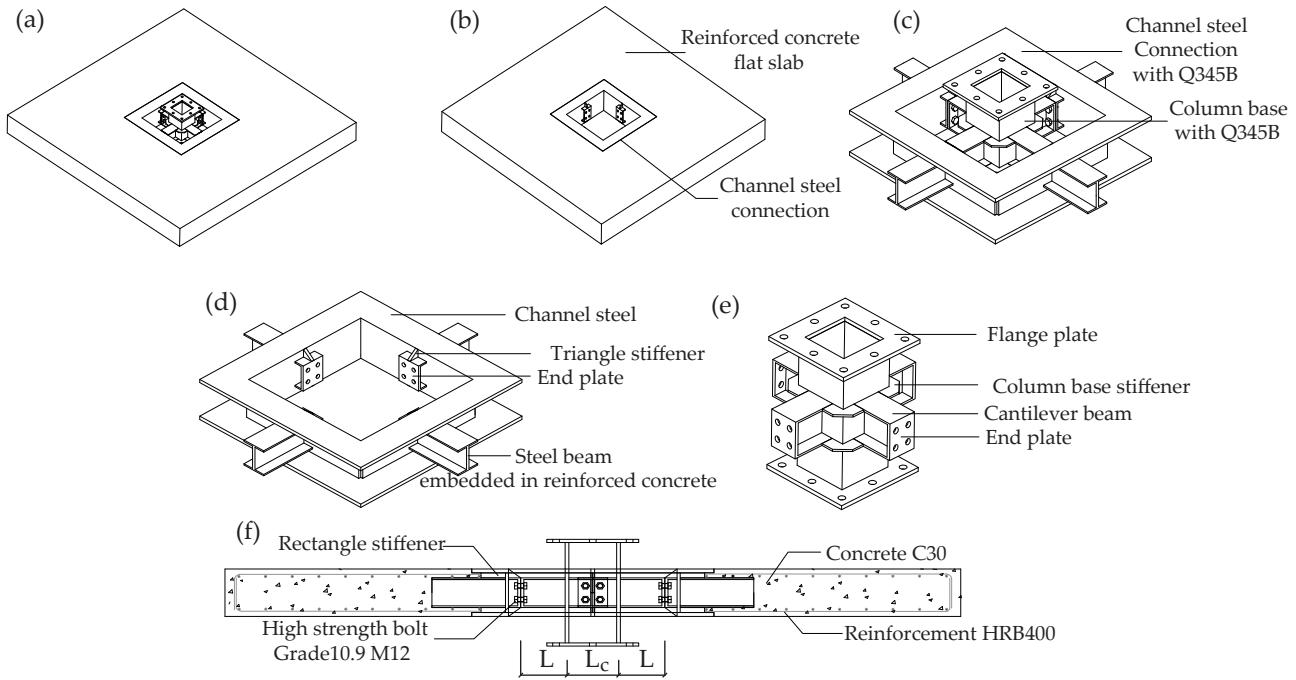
Configuration of prefabricated reinforced concrete flat slab to square steel tube column connection(Zhang et al., 2018): a) Slab-column connection; b) Reinforced concrete flat slab and channel steel section; c) Column base connection; d) Channel steel connection; e) Column base; f) Connection cross-section.
